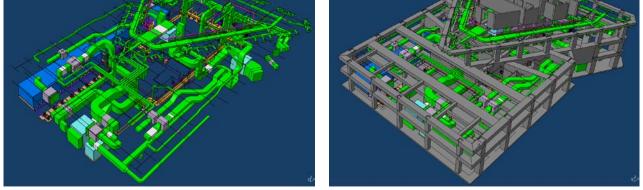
3D models for transfer floor MEP (left) and combined modeling with structure (right)
